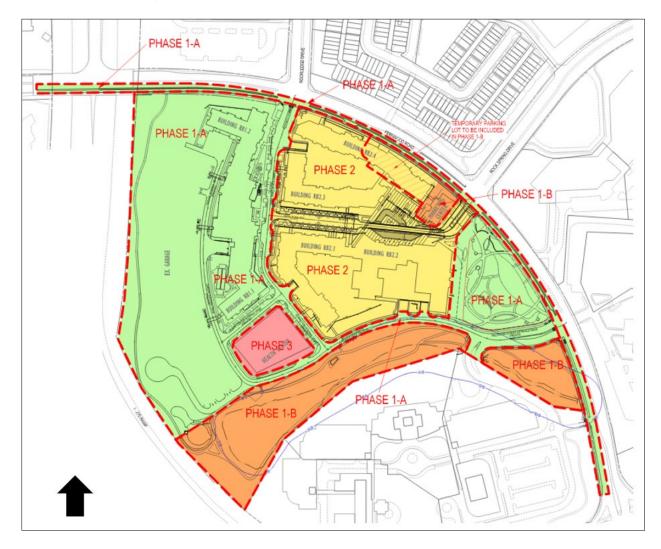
Project Phasing Plan (limits of Phase 1A shown in green)
